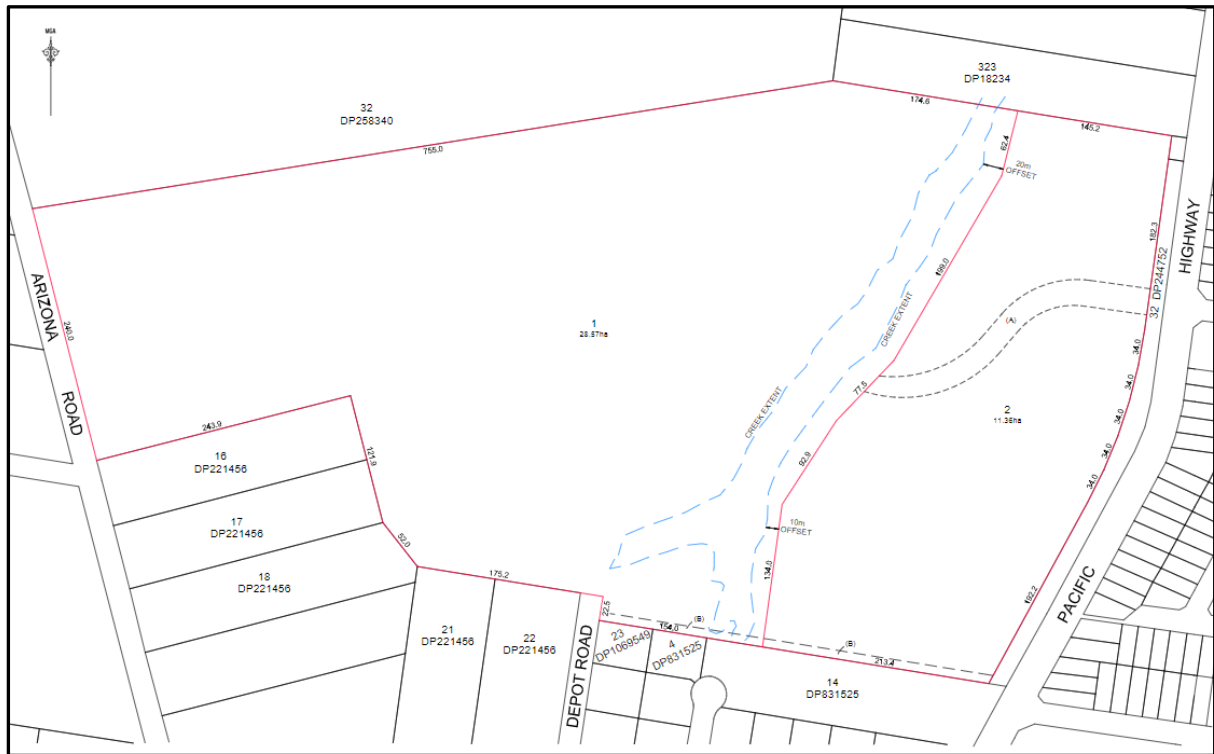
Proposed Subdivision Layout (Source: ADW Johnson)
